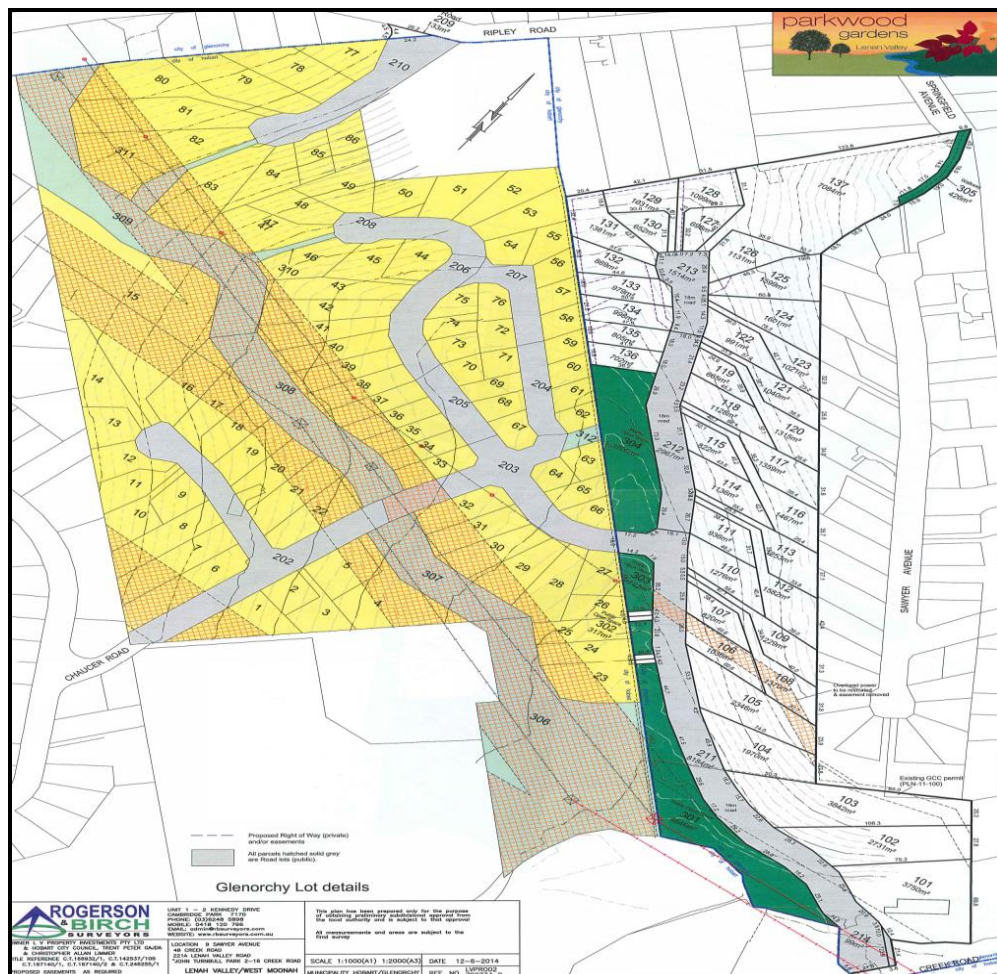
Location plan of road proposed to be named Kiewa Rise.
